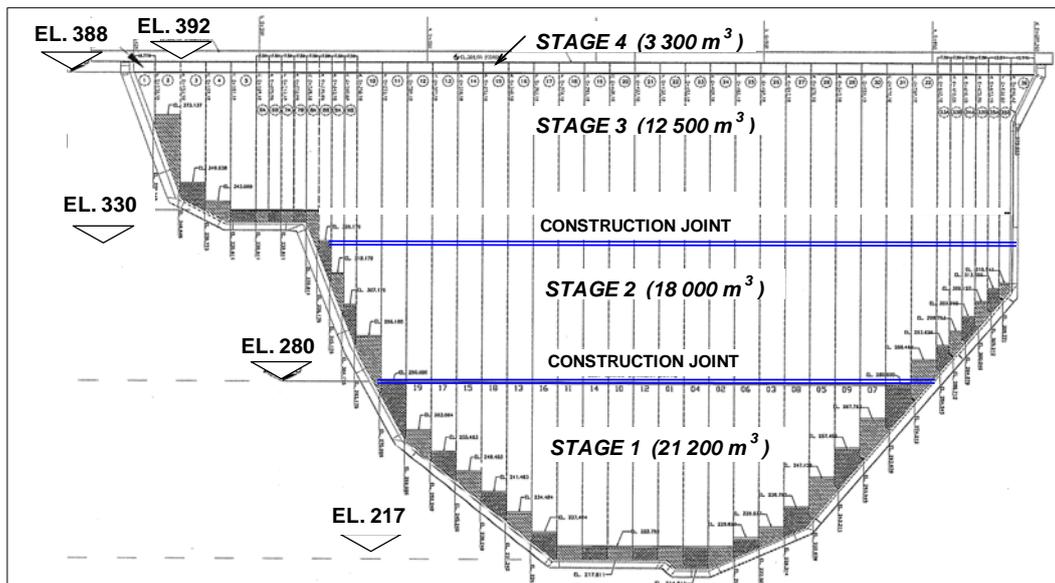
Slipforming stages for the concrete face and approximate concrete volumes.
